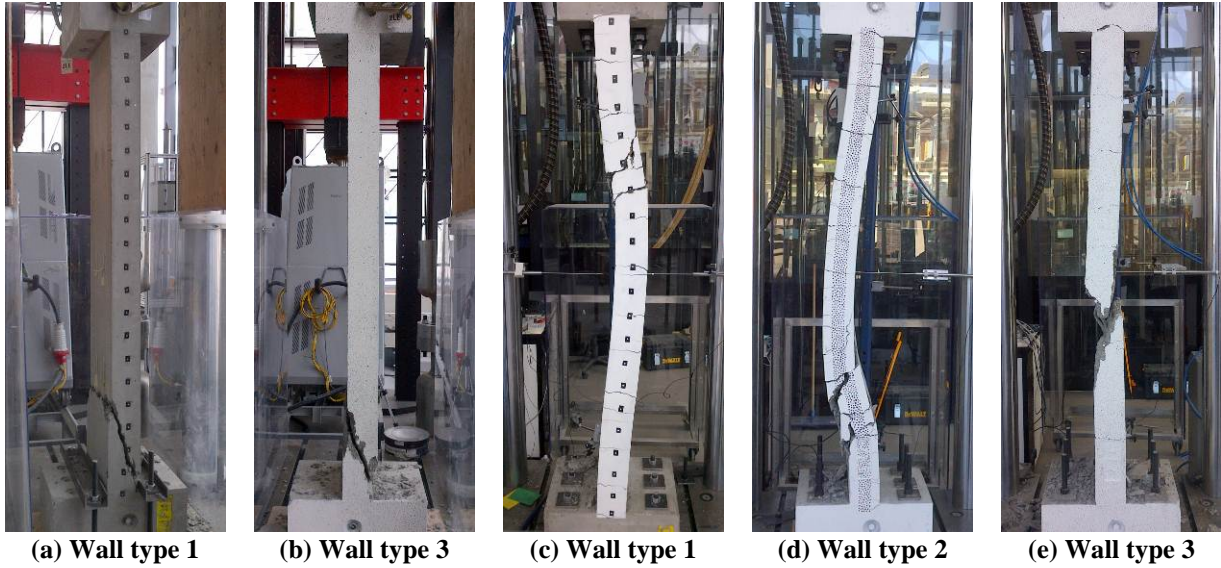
Left to right: wall type 1 compression test, wall type 3 compression test, wall type 1 tension-compression test, wall type 2 tension-compression test and wall type 3 tension-compression test.
